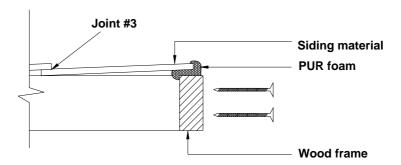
Cross section of polyurethane spray foam seal at the siding/wood frame interface at the top of the specimen assembly.
